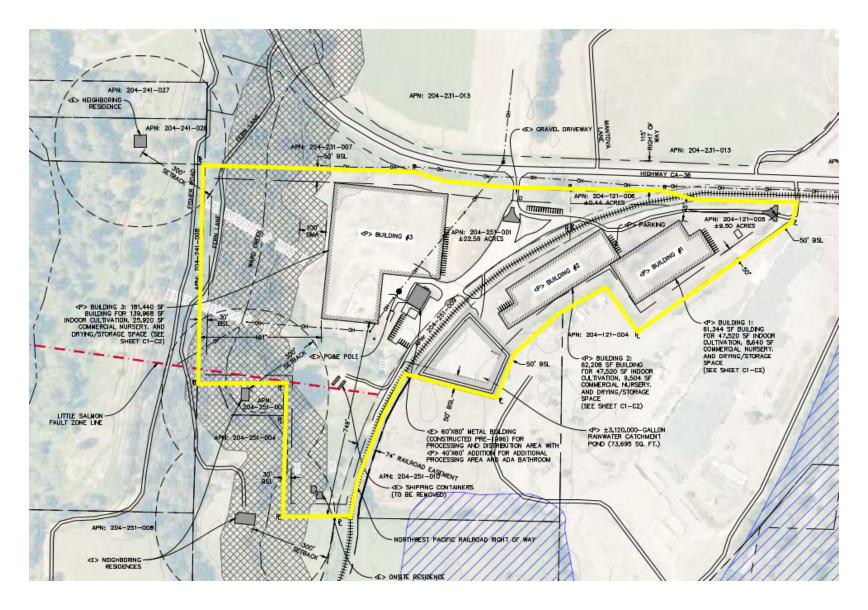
Proposed Project Site Plan - See Appendix 1 for full Plan Set (Source: Site Plans, NorthPoint Consulting Group, Inc., 2023)
